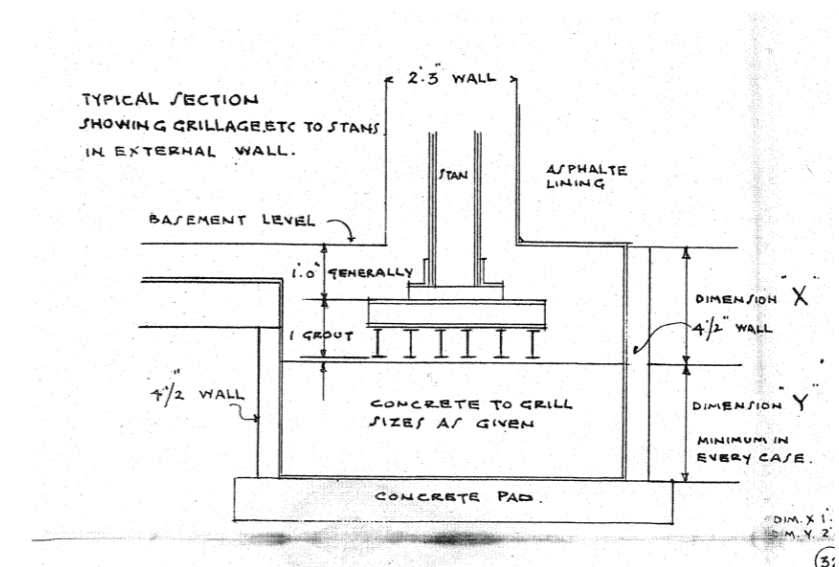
Existing structural drawing of pad foundations showing steel grillage system
